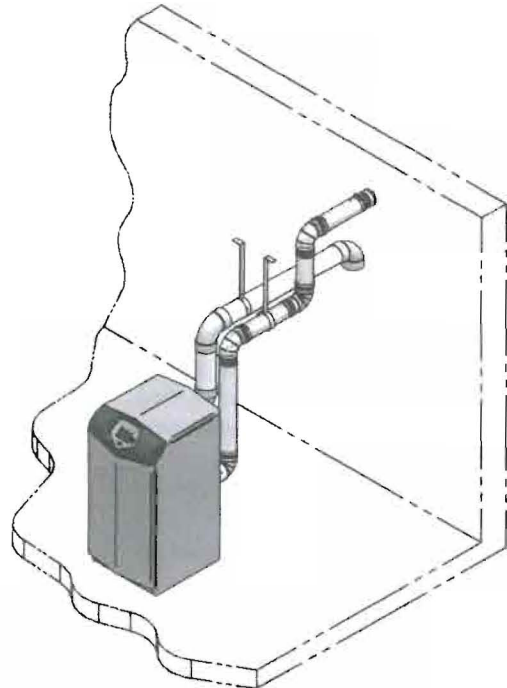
Stainless Steel Two-Pipe - See page 22 for more details
